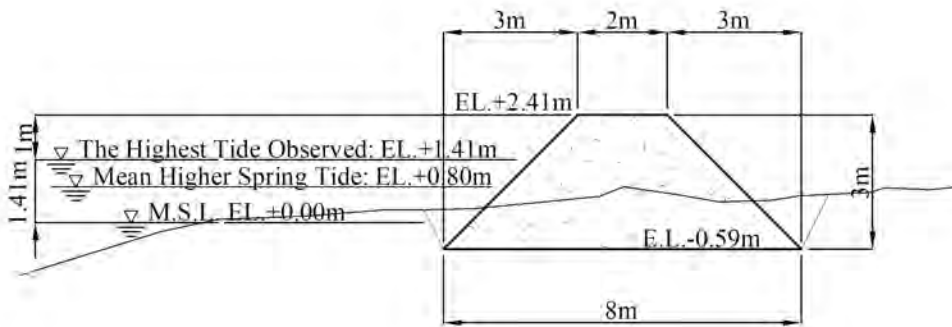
Typical Cross Section of Coastal Dike Type A: Concrete Dike
